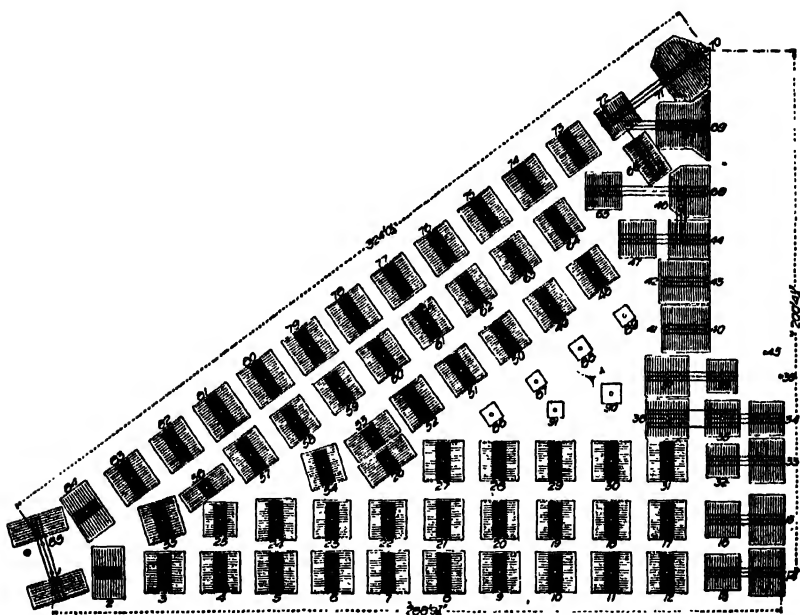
Grillage Plan of Phelan Building, San Francisco, Cal.
